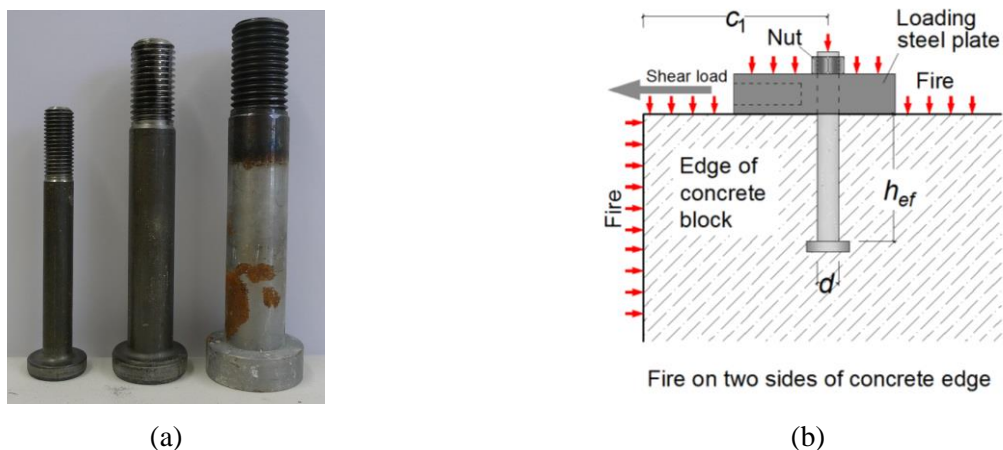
(a) Headed stud anchors used in the present study; (b) anchor configuration and applied fire on two sides of the concrete edge.
